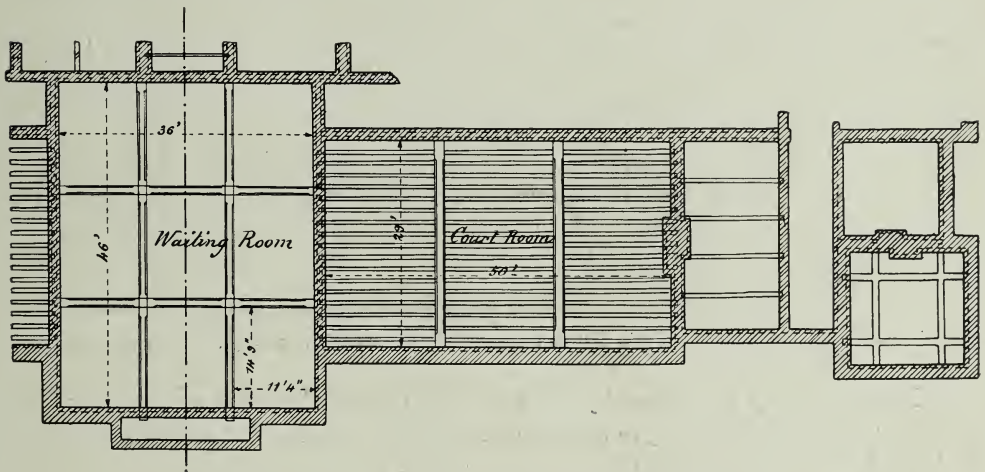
Floors of Court House, Verviers, Switzerland.
